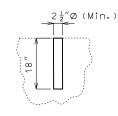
/4"Ø THRU OPTIONAL DETAIL OF 1 3/8"Ø 2 1/2"Ø ANCHOR BOLTS THRU 2 1/2"Ø ANCHOR BOLTS
